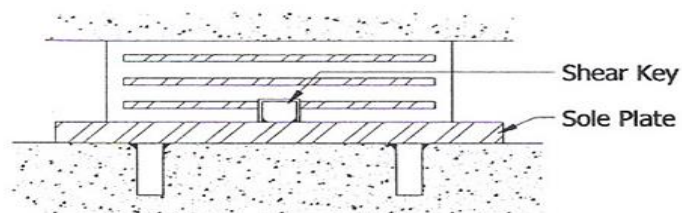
Elastomeric Bearing Pad (EBP) with Shear Key
